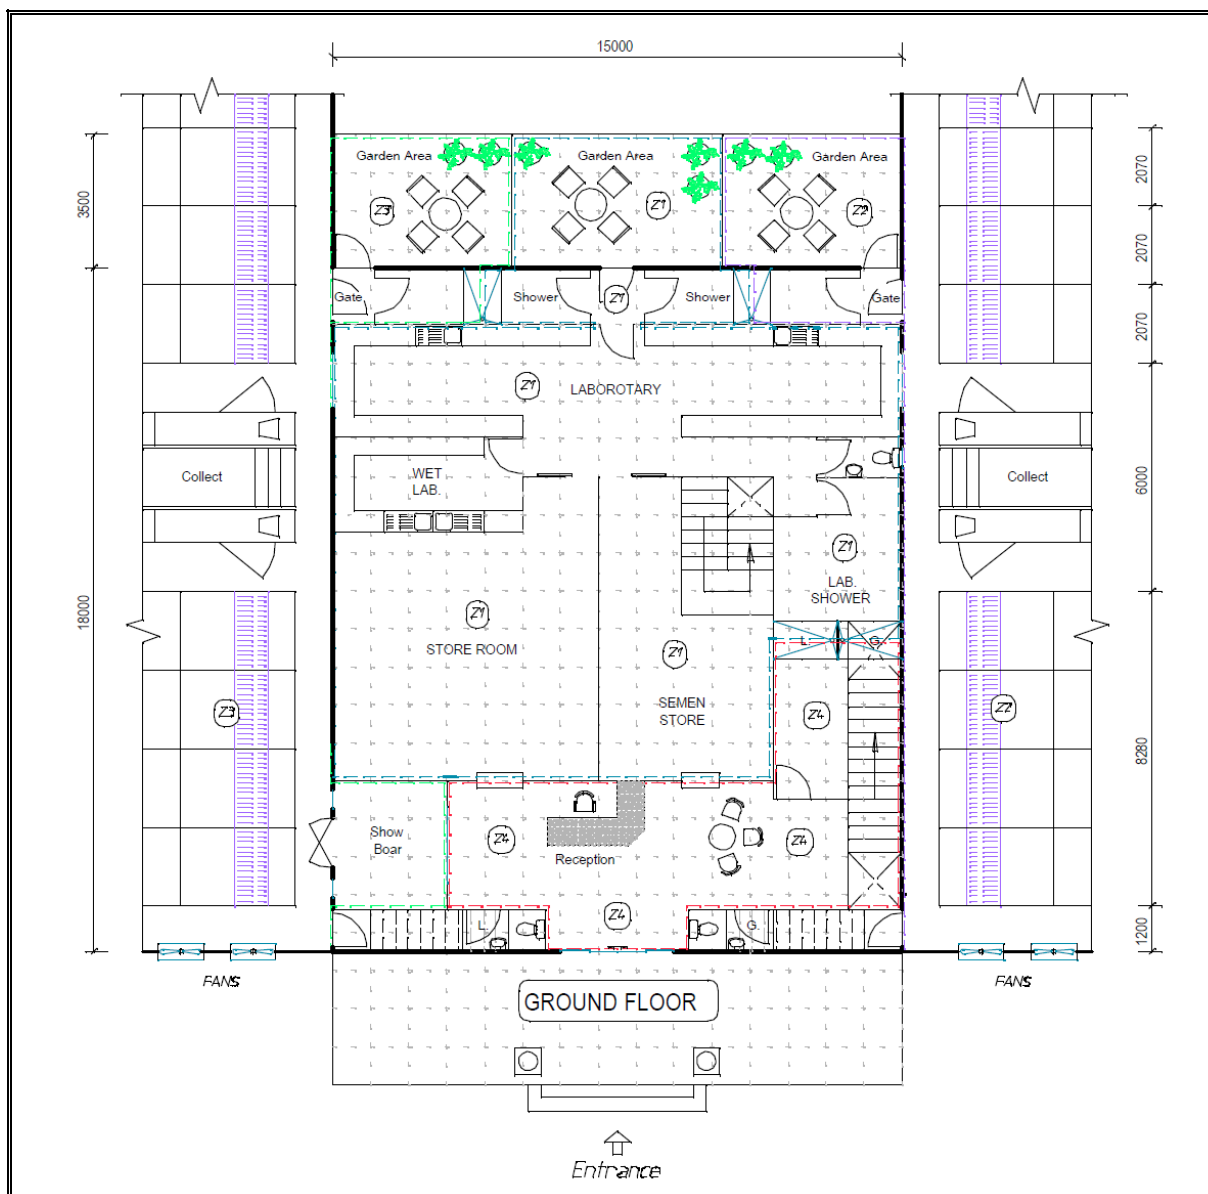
Proposed ground floor layout for the offices and laboratory (designed by Dalein Plaasbou, 2017)
